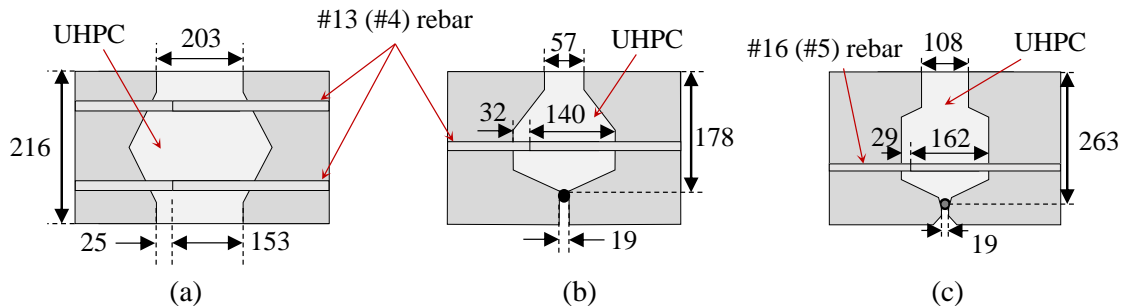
Summary of UHPC joint shapes for: (a) decked girders, (b) AASHTO BI, and (c) Florida Slab Beam (units: mm, 1 mm = 0.0394 in.)
